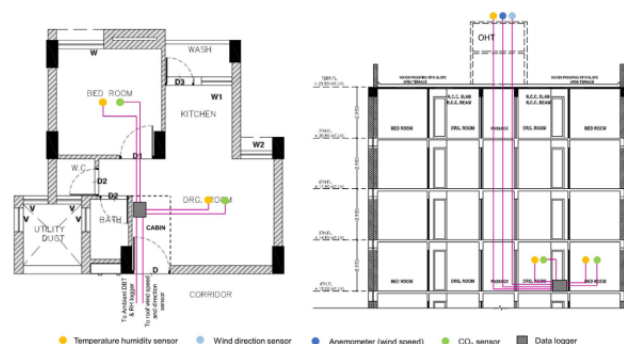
Plan and section of the test flat showing location of sensors and loggers
